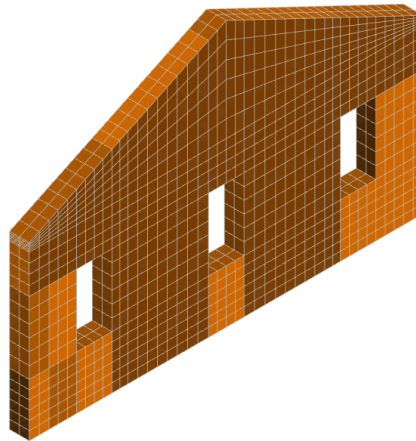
Isometric View of Fog Room Gabled Wall, Connections Scheme
